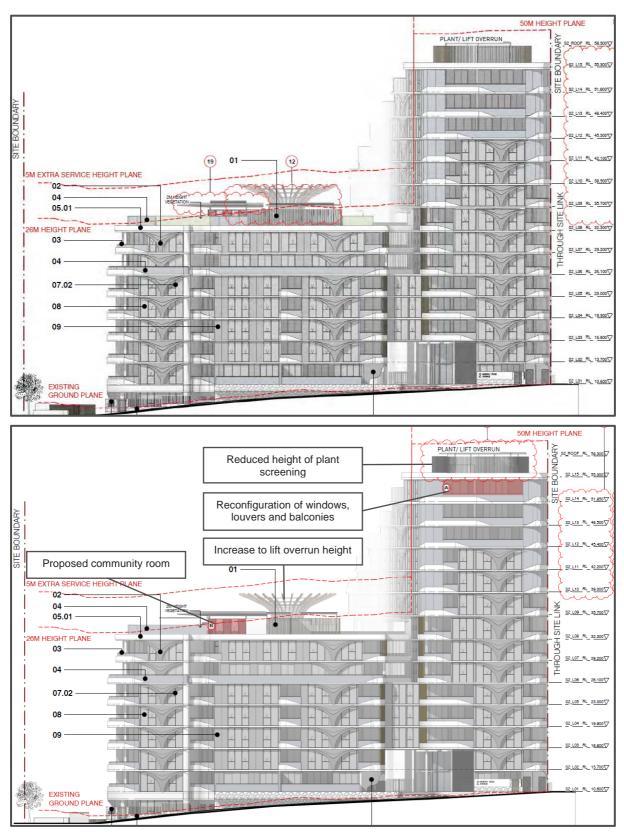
| Northern elevation of Building 2: approved MOD 1 (above) and proposed (below) (source: SSD 9403 MOD 1 Approved Plans and Applicant's RtS)
